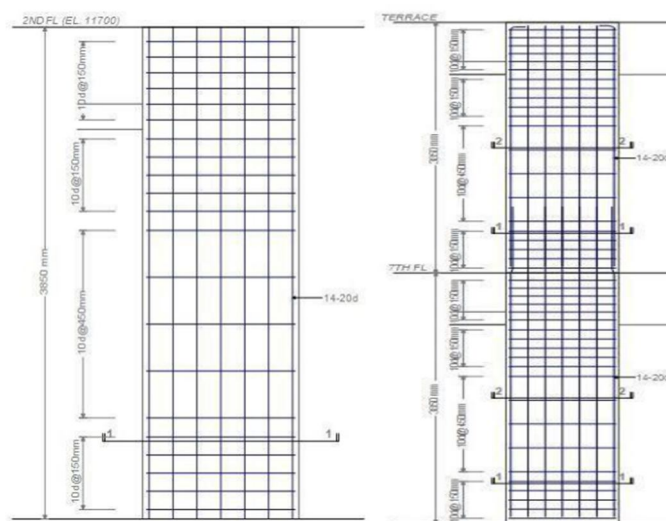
Beam and Column Reinforcement Layout (ETABS Snapshot)
